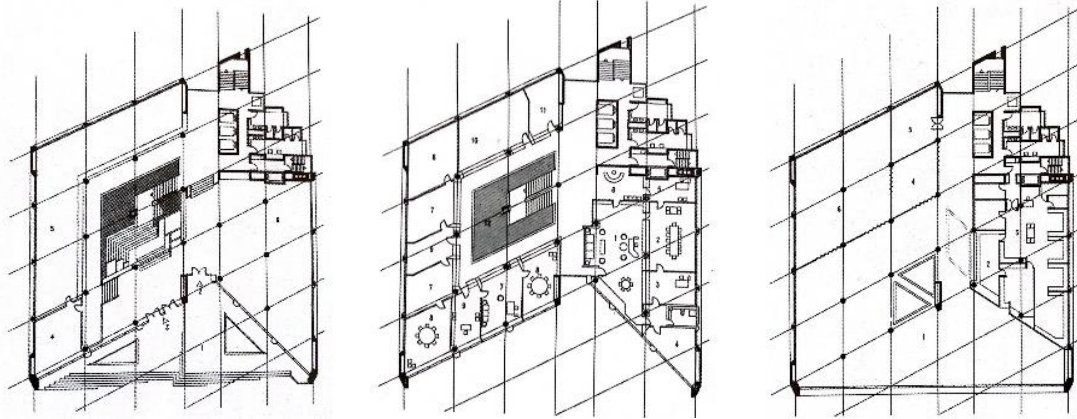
Şekerbank Ground Floor Plan - Executive Office Floor Plan - 6th Floor Plan [20].
